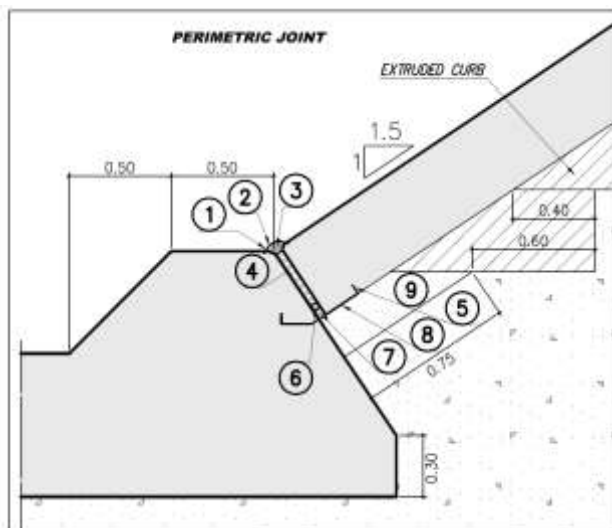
Perimetric joint detail (reproduced with permission of EnerjiSA).
